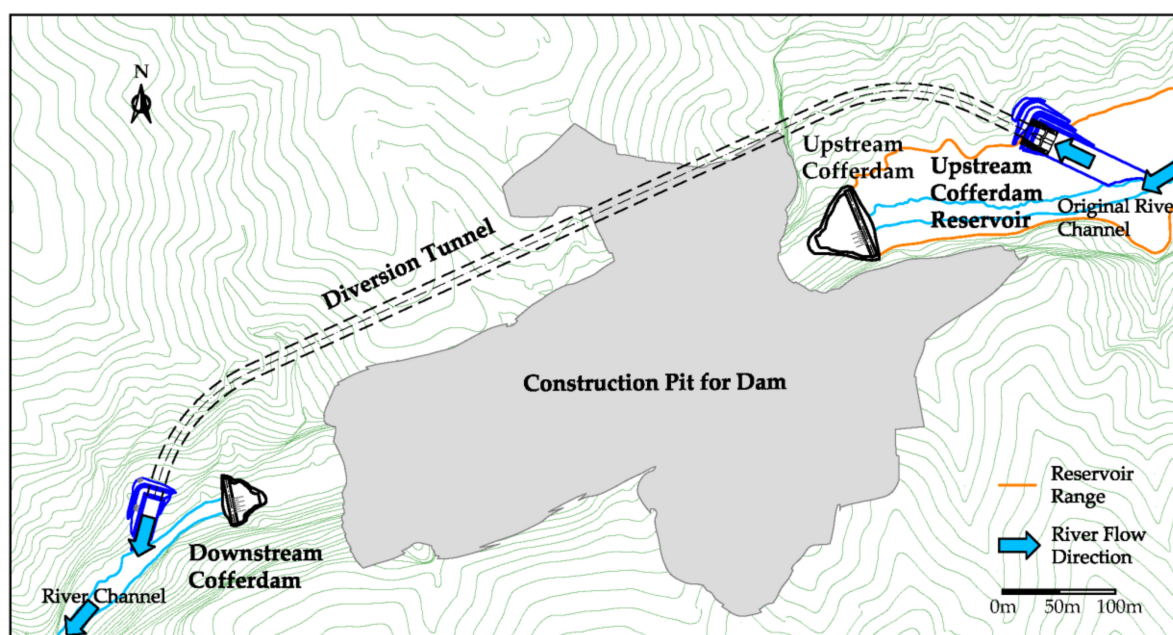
Typical layout of cofferdam and tunnel mode dam construction diversion.
